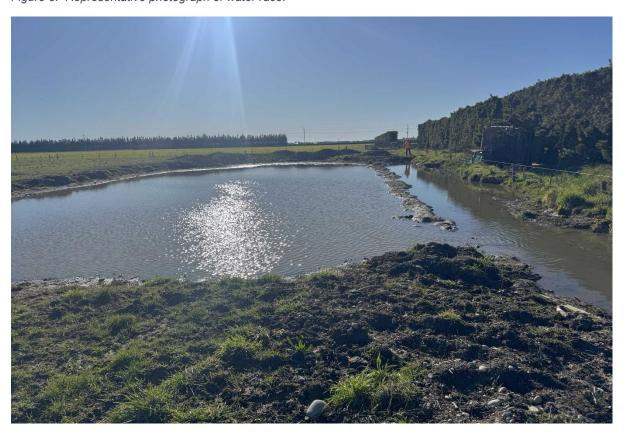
A stock water pond formed from the water race, downstream of the development site.
